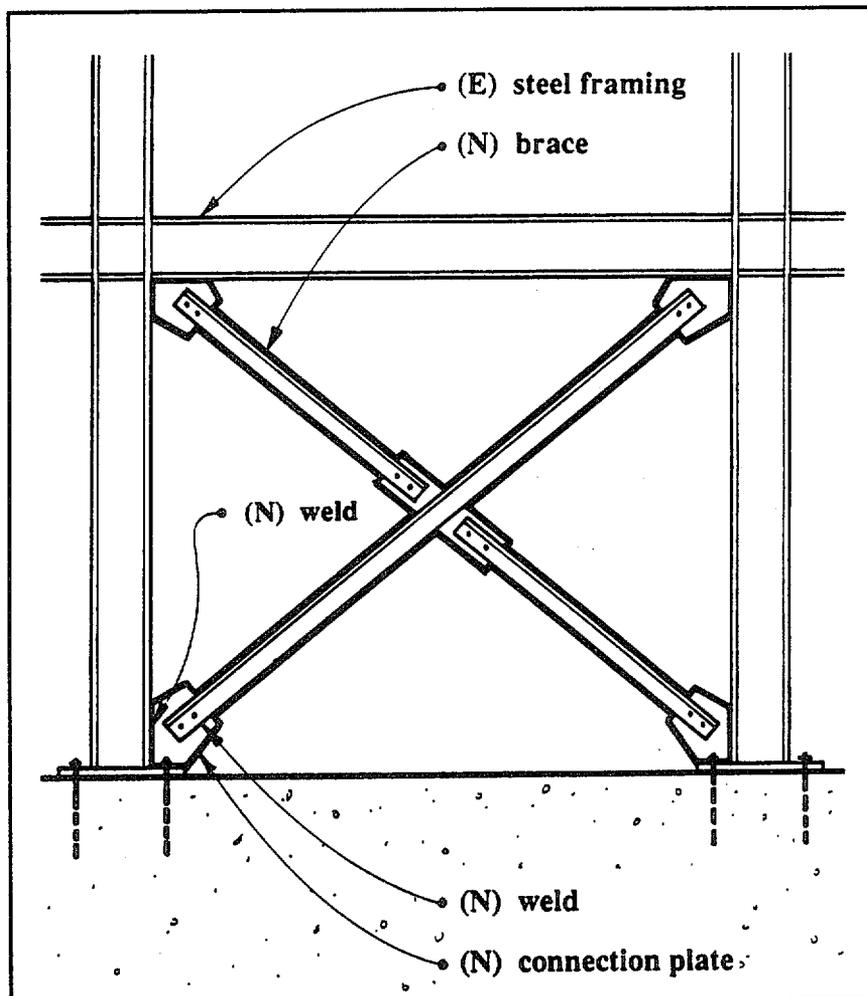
Addition to or replacement of an existing X-brace.
